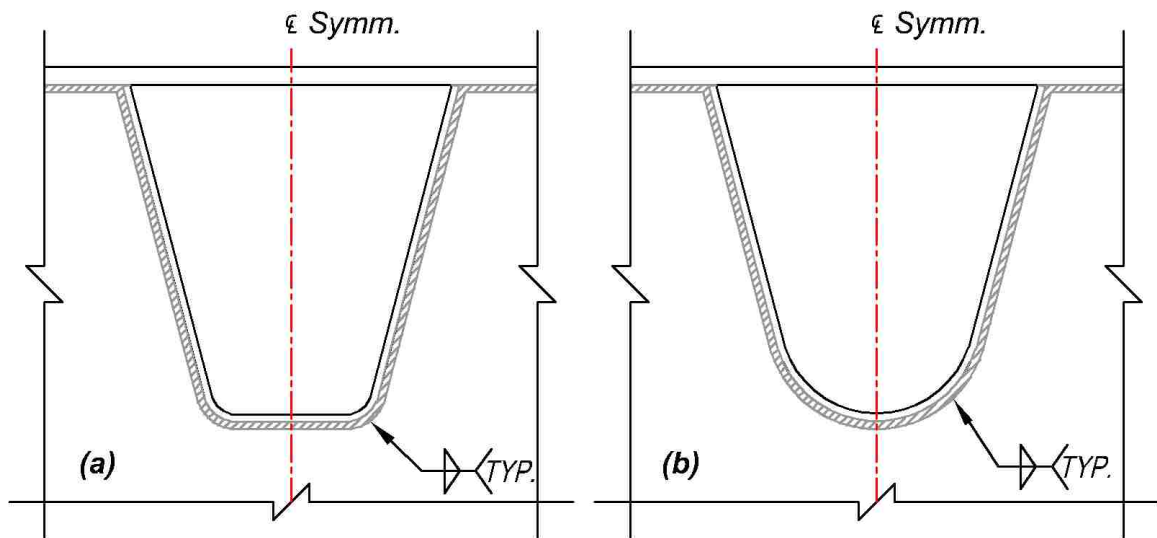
Type 1 rib-to-floor beam connection: (a) Type 1A with trapezoidal rib; (b) Type 1B with round-bottom rib
